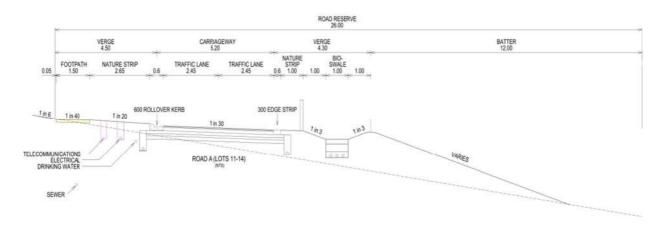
Proposed Subdivision Typical Road Cross Section (fronting creek area showing proposed water treatment)
